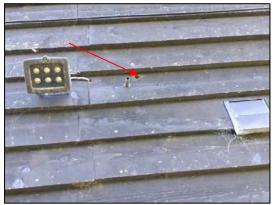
Hole in the outer wall of Building 1 Photo 6. Gap in the door frame of Building 1
